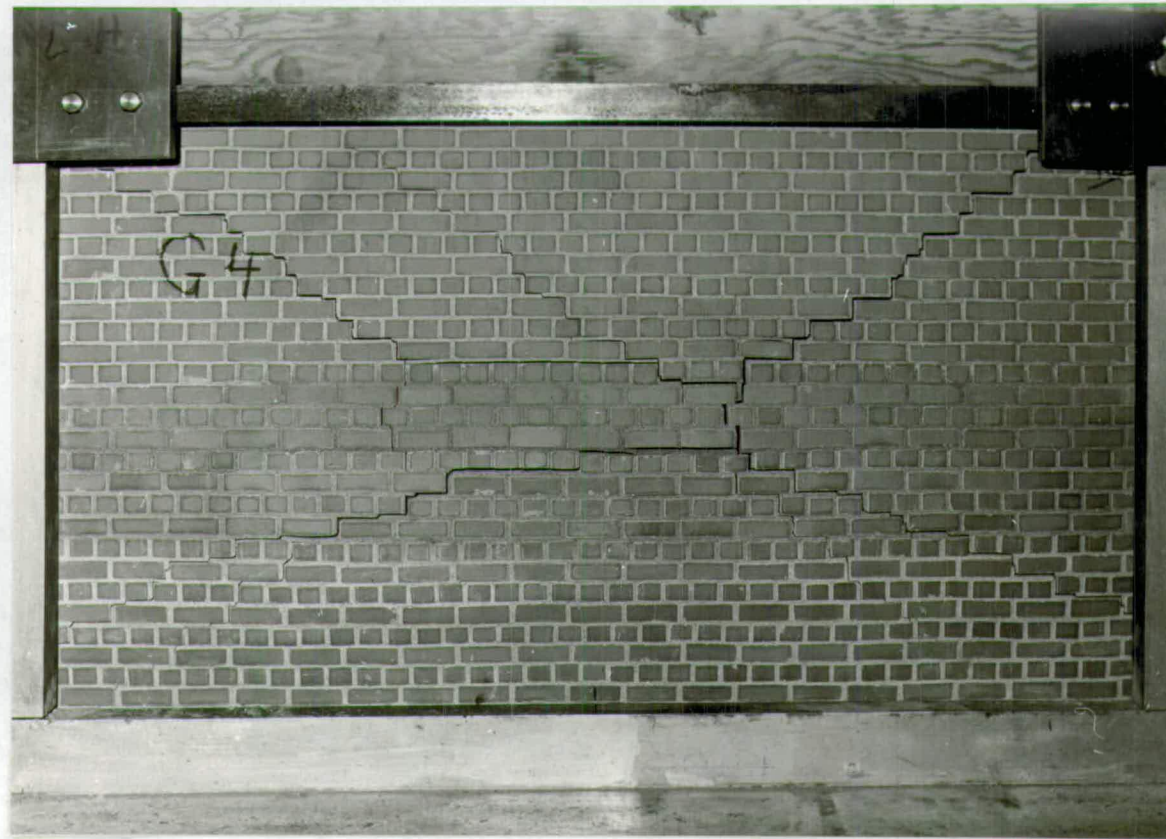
FAILURE OF WALL G4 - 4 SIDES SUPPORTED
